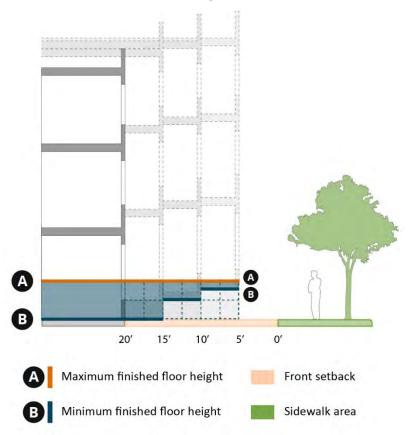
Finished Floor Range for Ground Floor Residential Units
